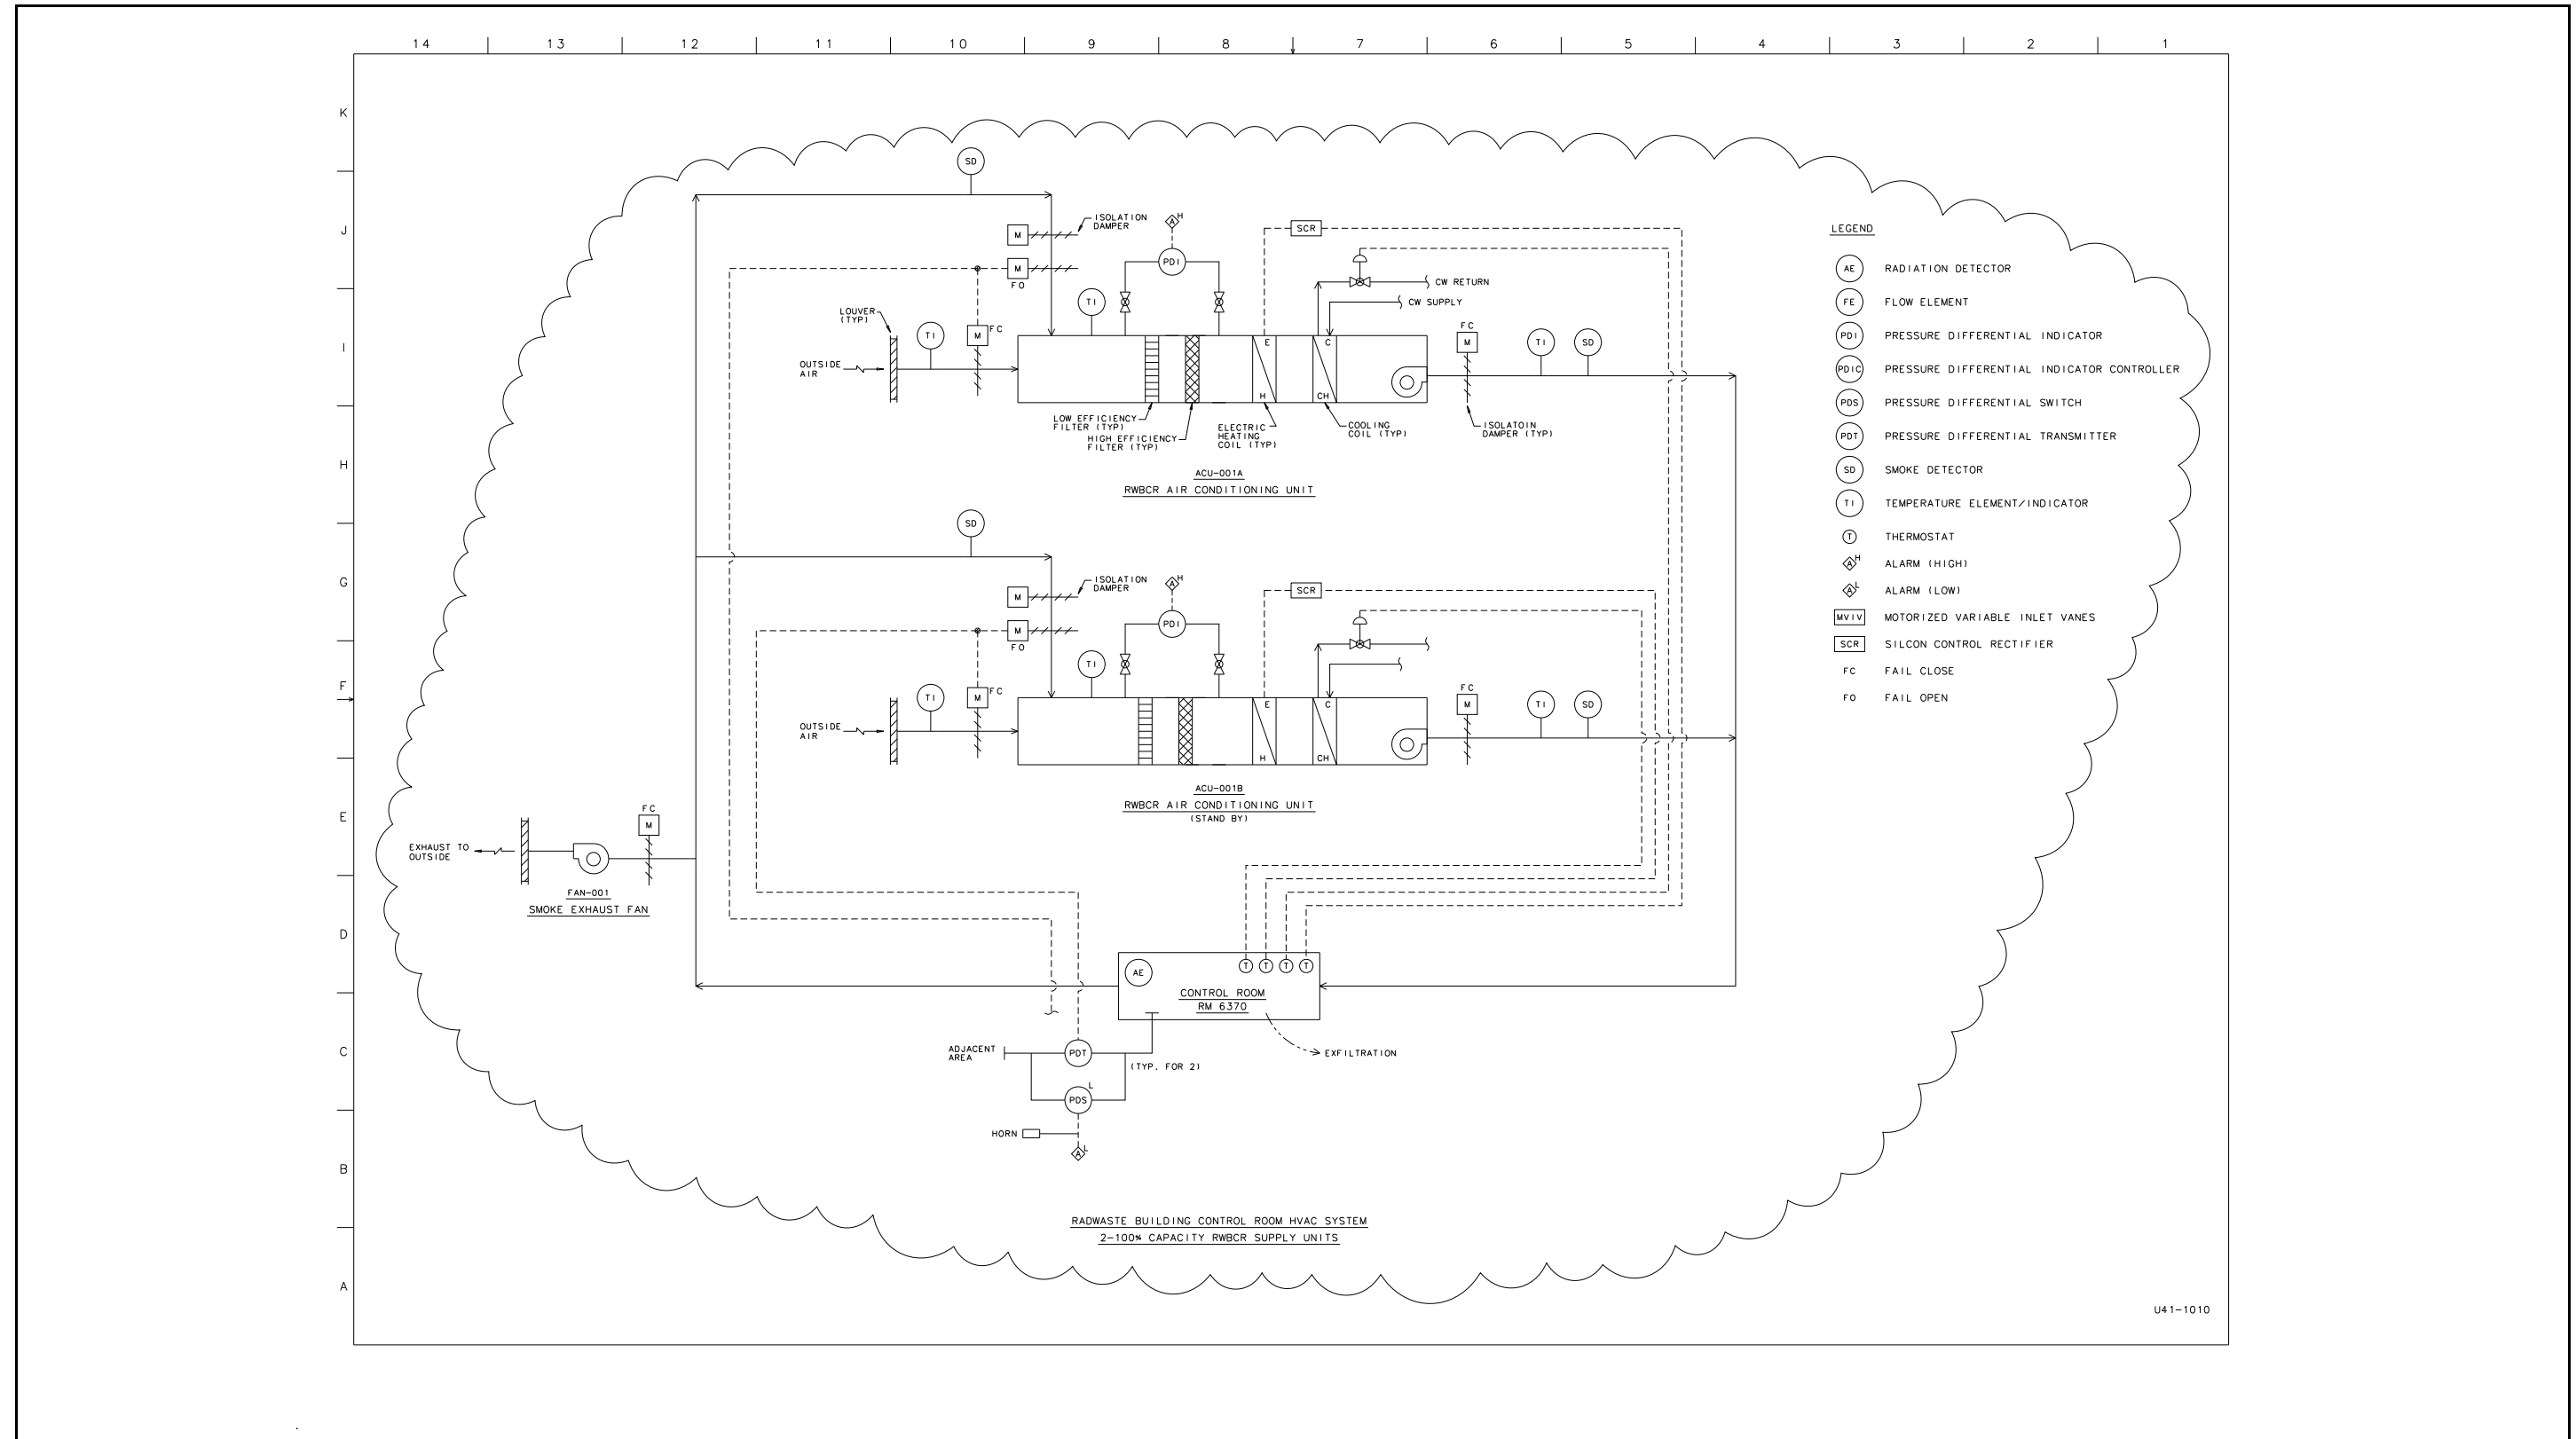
Radwaste Building HVAC P&ID (Sheet 1 of 3)
